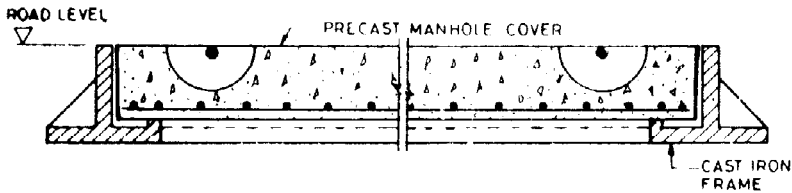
PRECAST CONCRETE MANHOLE COVER WITH CAST IRON FRAME
